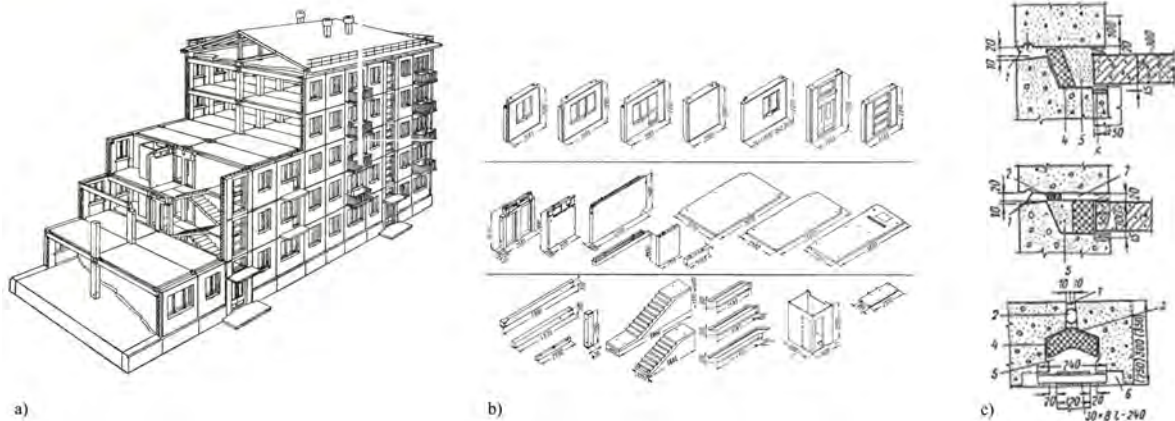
The I-335 type: a) axonometric view of the building (1957); b) construction panels; c) constructive details.
